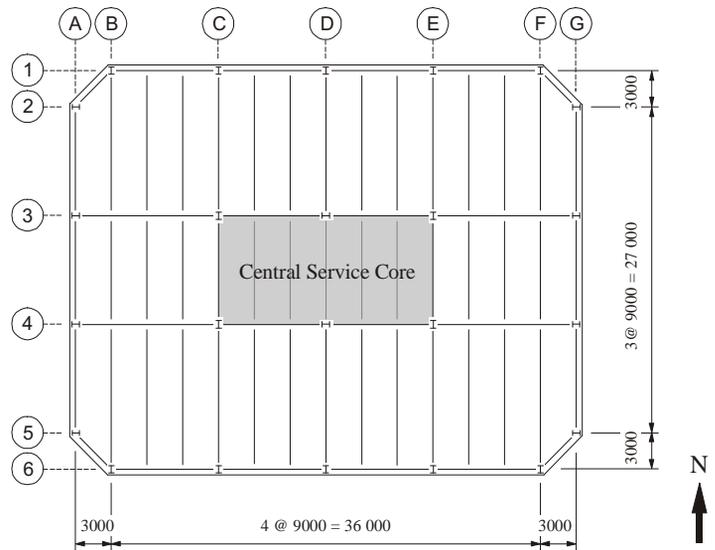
Steel building, typical floor plan (CISC, 2009)
